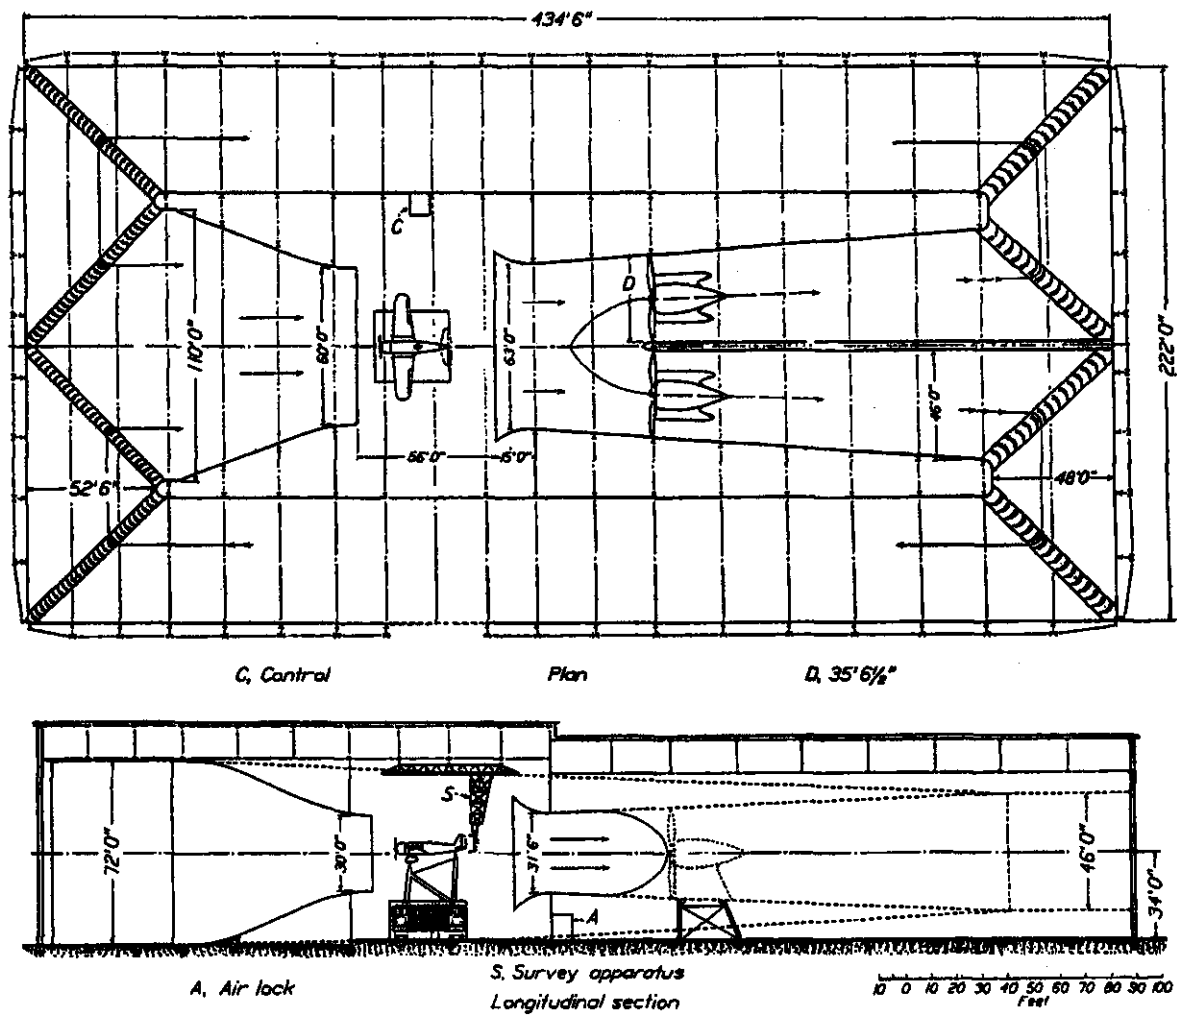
Plan and Elevation, Full-Scale Wind Tunnel
